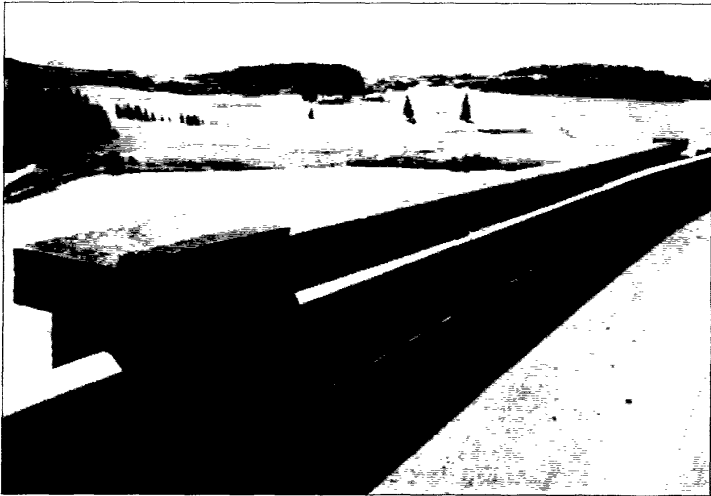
Thrie-Beam Retrofit (Washington)
